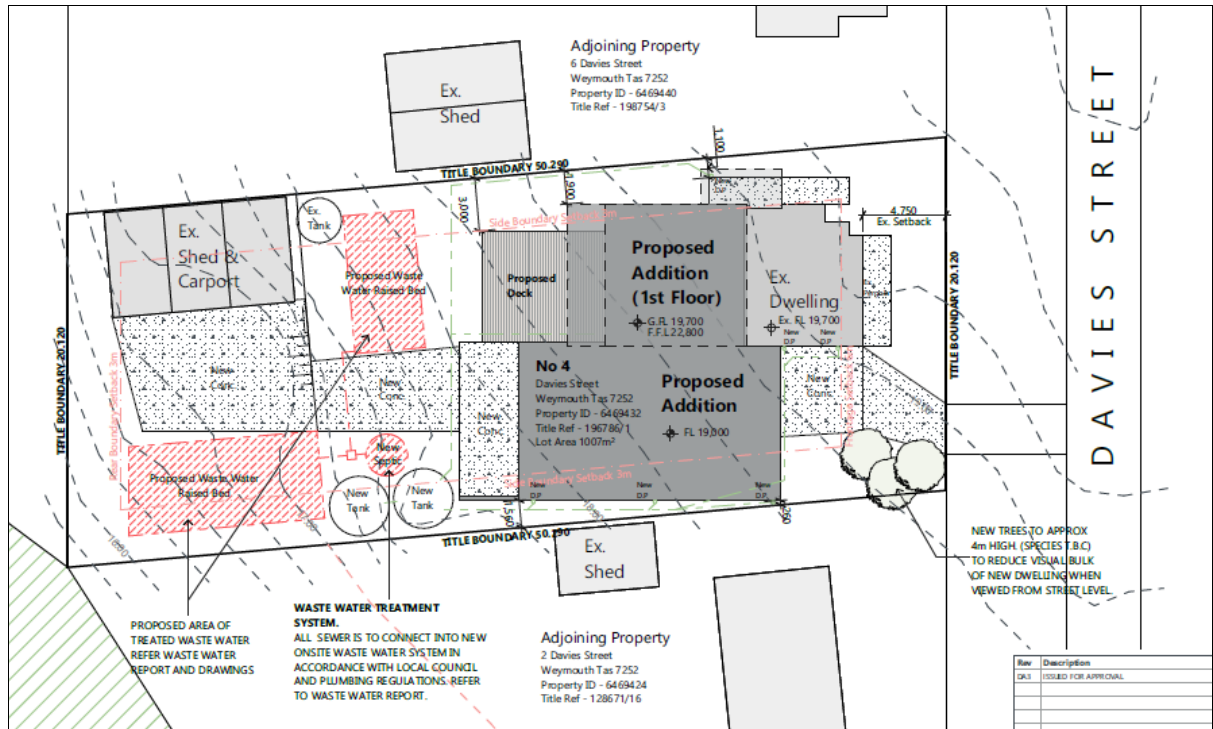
Proposed Site Plan (Cataract Designs, 2021)
